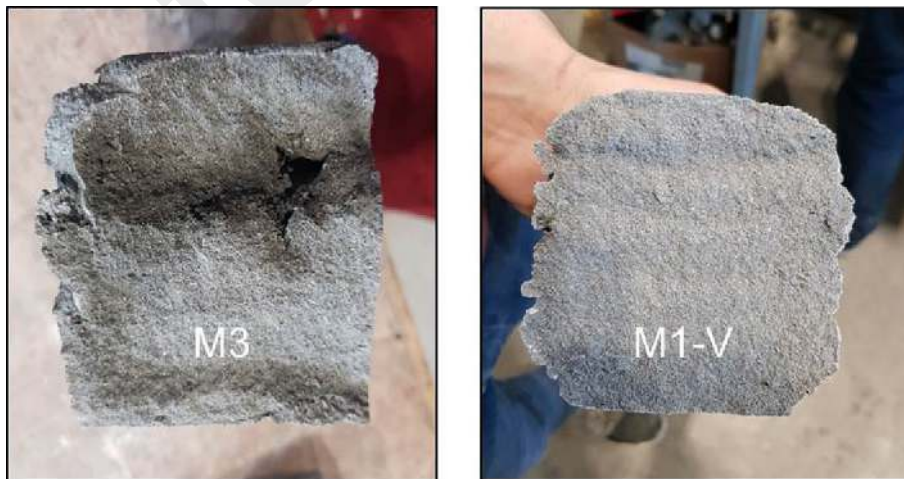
Fracture surface of printed samples of M1-V and M3 mortar mixtures after the flexural test.
